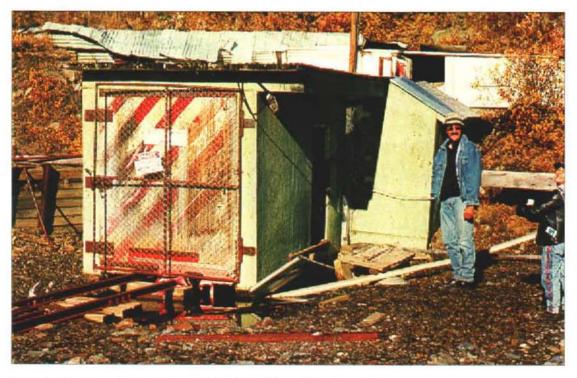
Keno 700. Mine adit shed (building 7) looking N.W.
